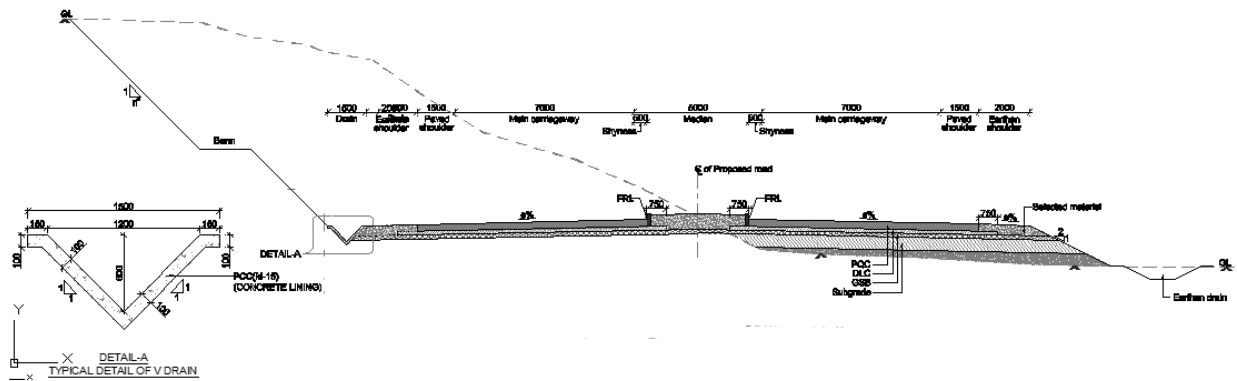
TCS-7B 4-Lane Carriage Way(Left Side Cutting)
